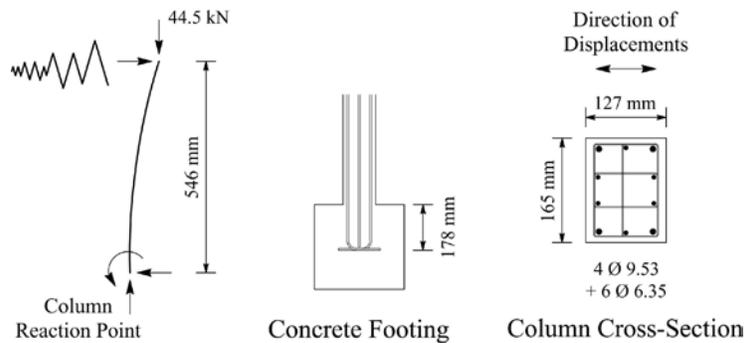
Geometry of the Specimen 1 of Low and Moehle [12]
